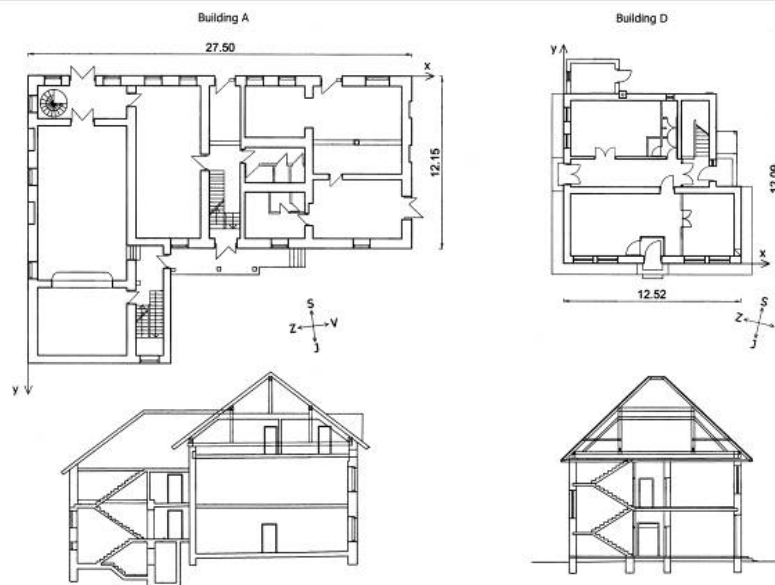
Plan and section of typical analyzed buildings A and D (Tomažević et al. 2005)
